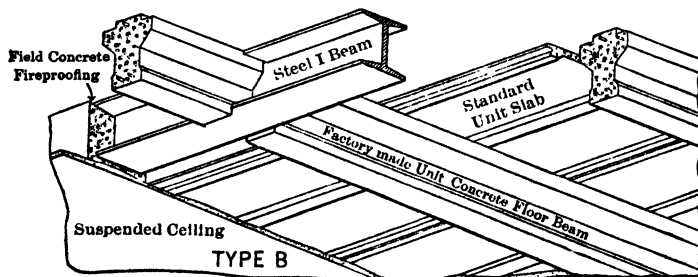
Watson Reinforced-Concrete Floor-Construction. With Slabs
